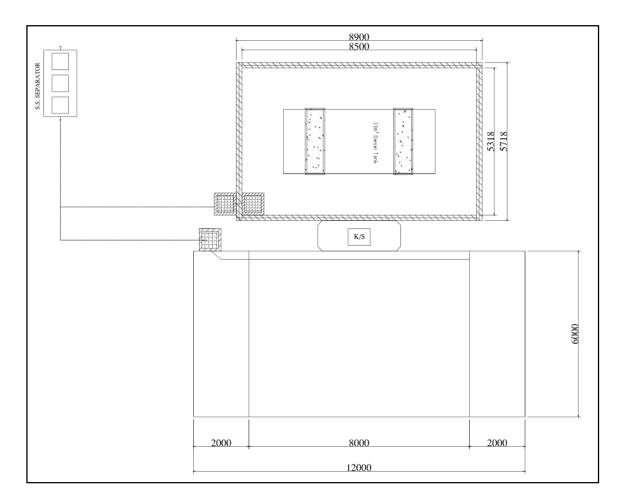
Design of installation set-up, with concrete floor at dispensing areas
